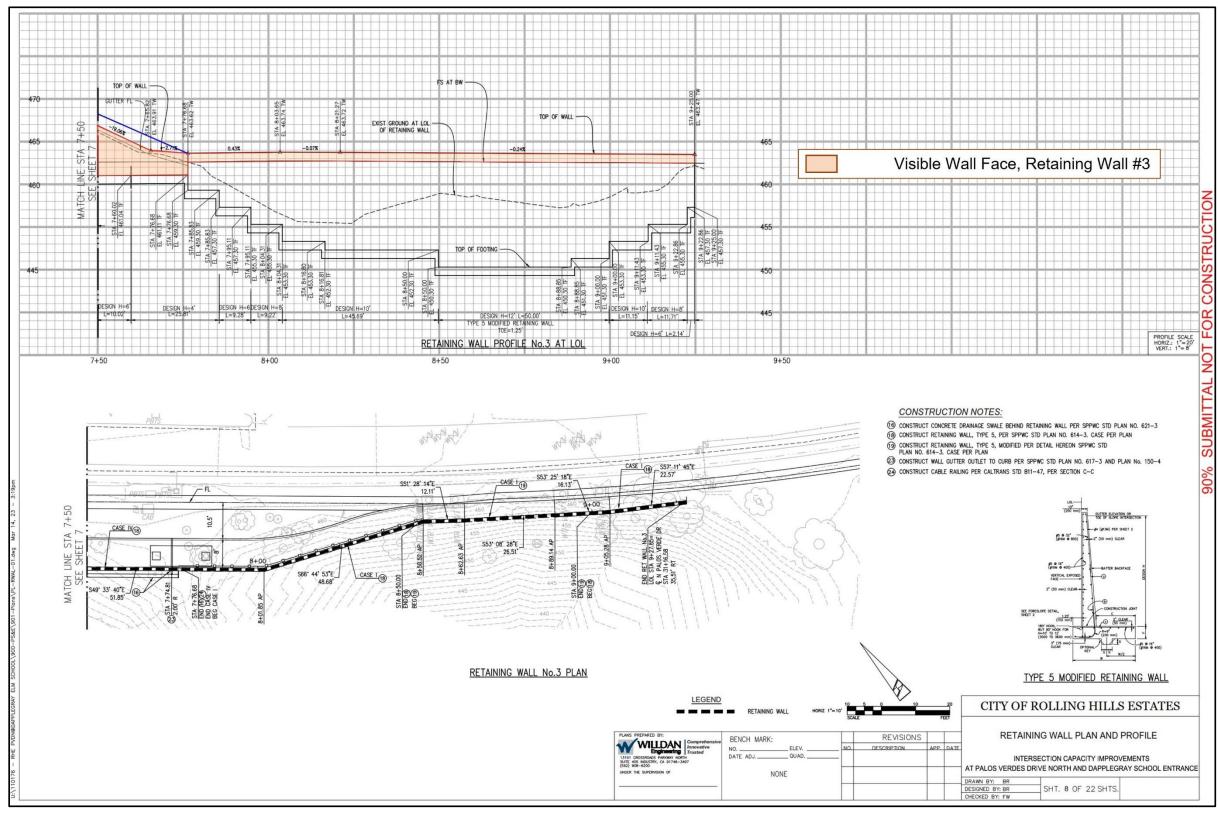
Retaining Wall No. 3 (Schematic Illustration)
